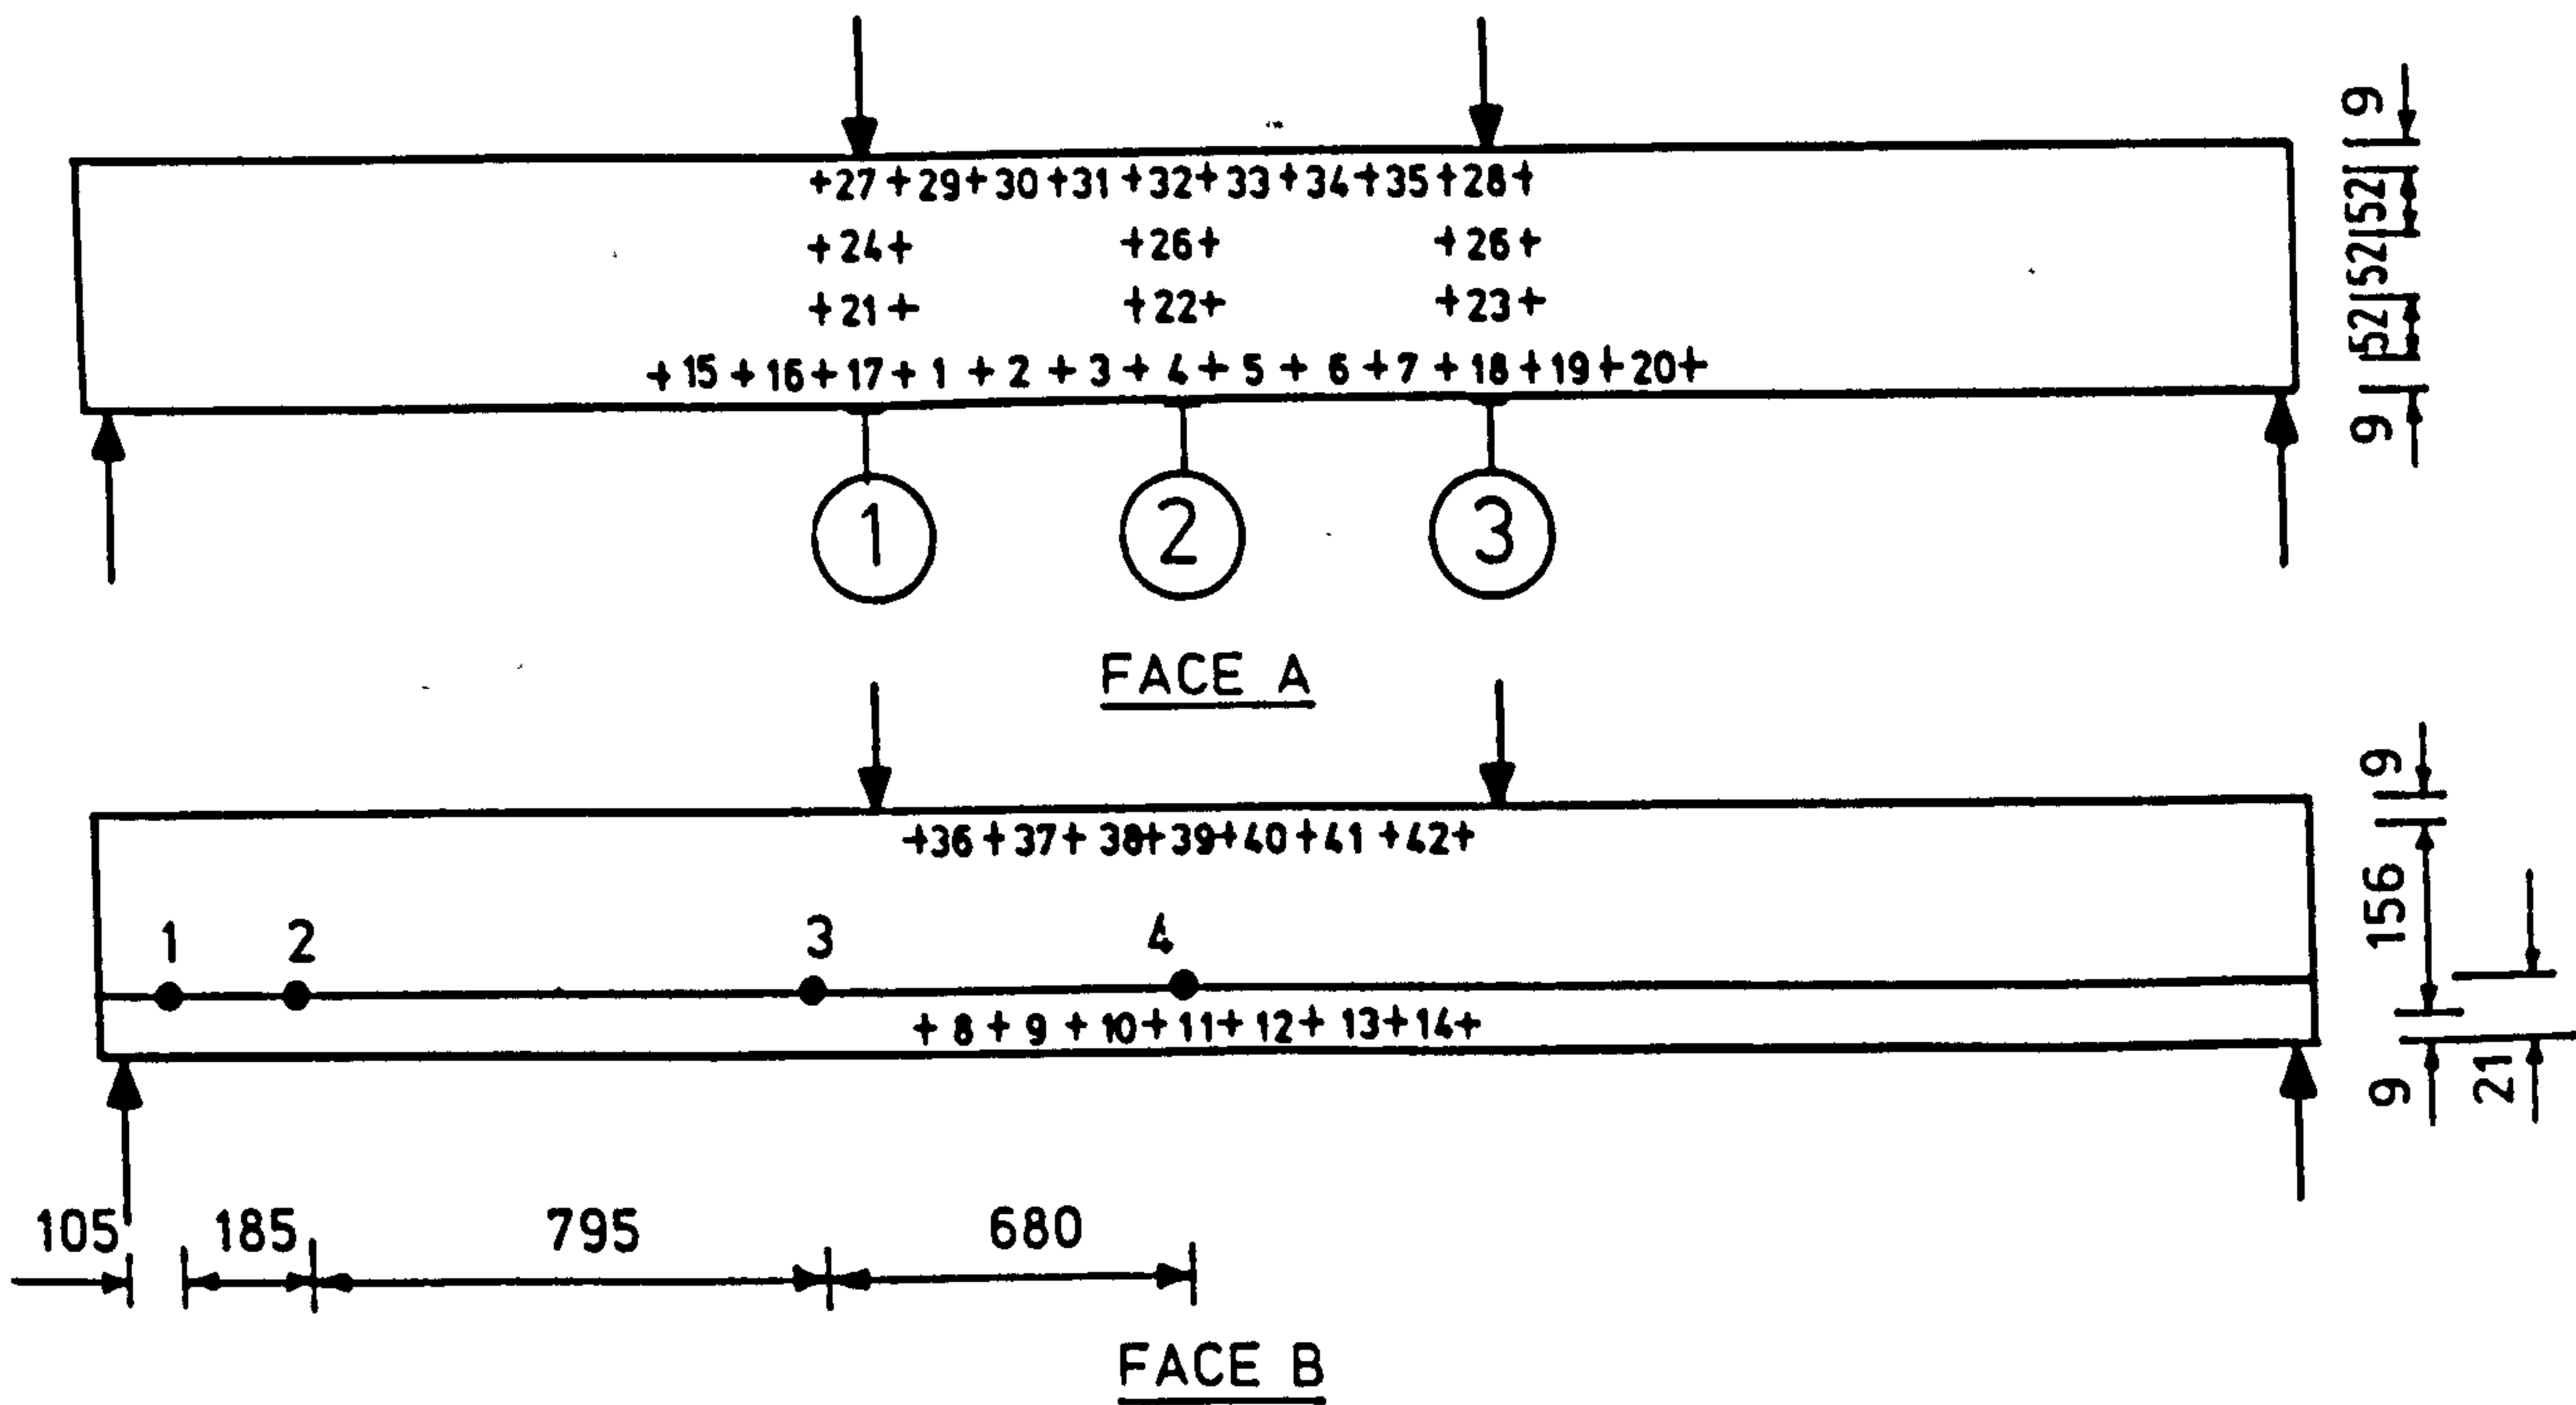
TRANSDUCER AND DE-MEC POINT LOCATIONS FOR NEW BEAM
